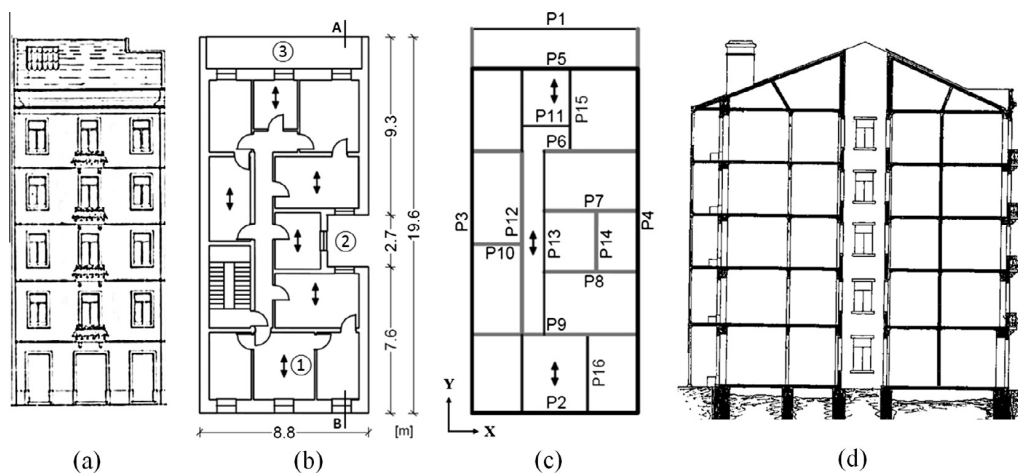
“Gaioleiro” building type I: (a) front view, (b) plan view, (c) identification of the walls and (d) cut section view AB. Legend: 1 – orientation of floors, 2 – side shaft, 3 – back balcony.
